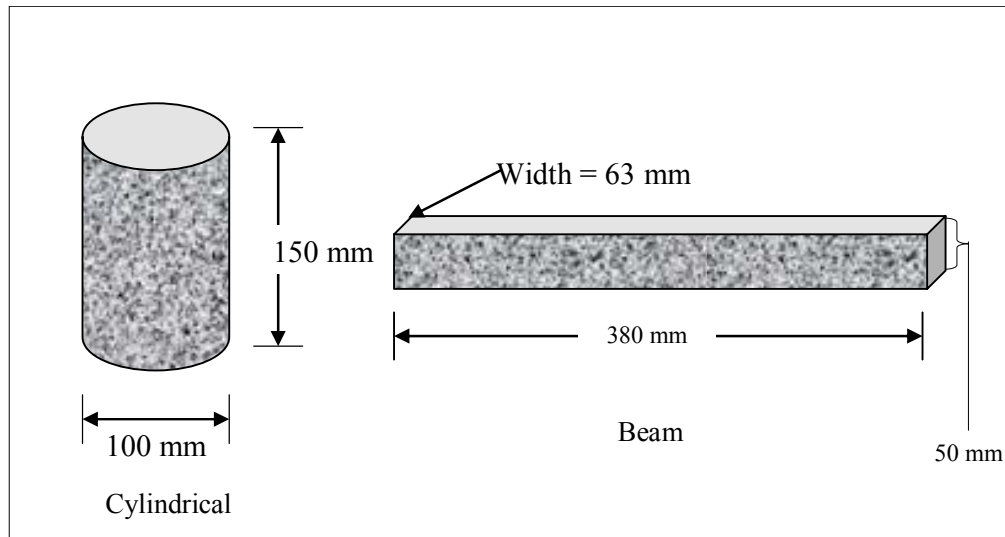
Laboratory Test Specimens (Drawing Not to Scale)
